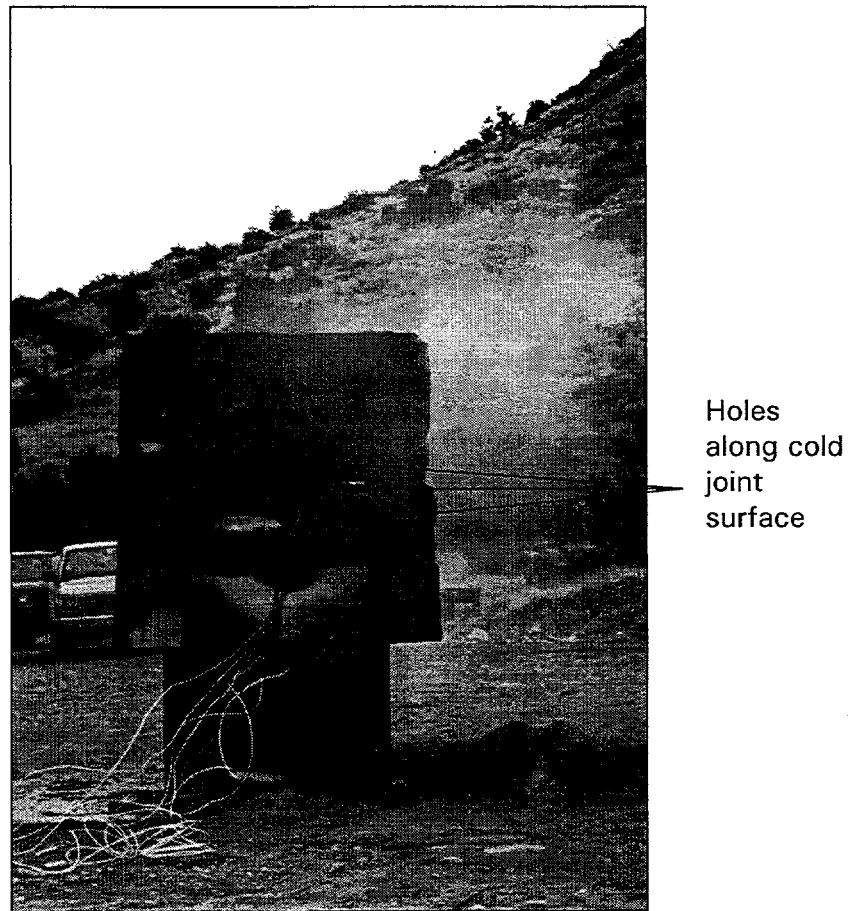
Rear of Block Wall (showing thermocouple cable and holes burned through the foam)
